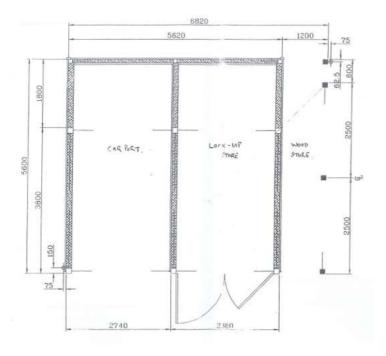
; Reduced plans of the modern garage building consented under 21921/008.
